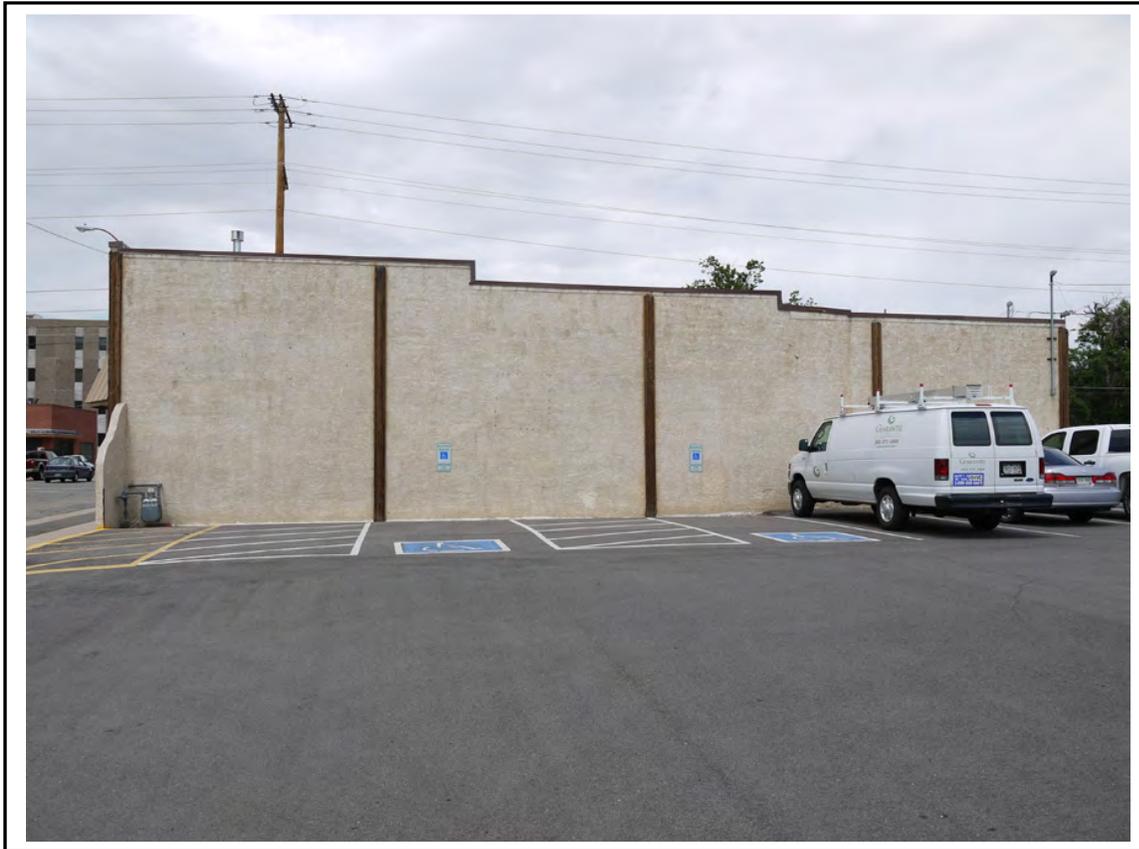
View of 1028 Main Street, south façade, showing stepped parapet wall at roof line.
